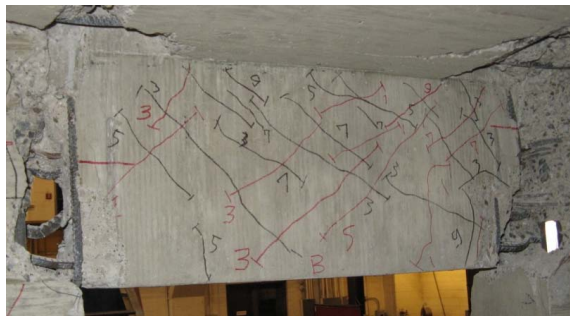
Damage to wall piers at the end of each test (east wall pier is on the left) (Lequesne, 2011)
